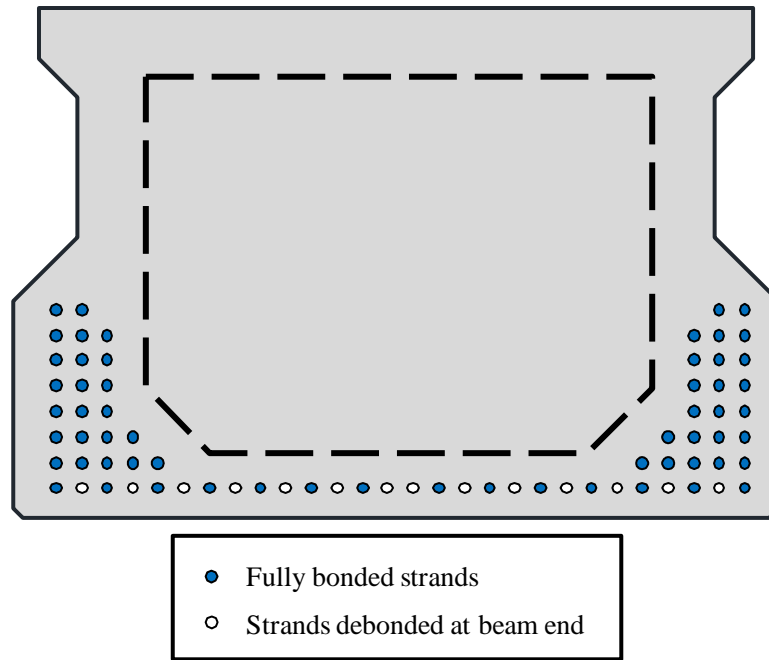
Strand Pattern used in beam presenting spalling problems
